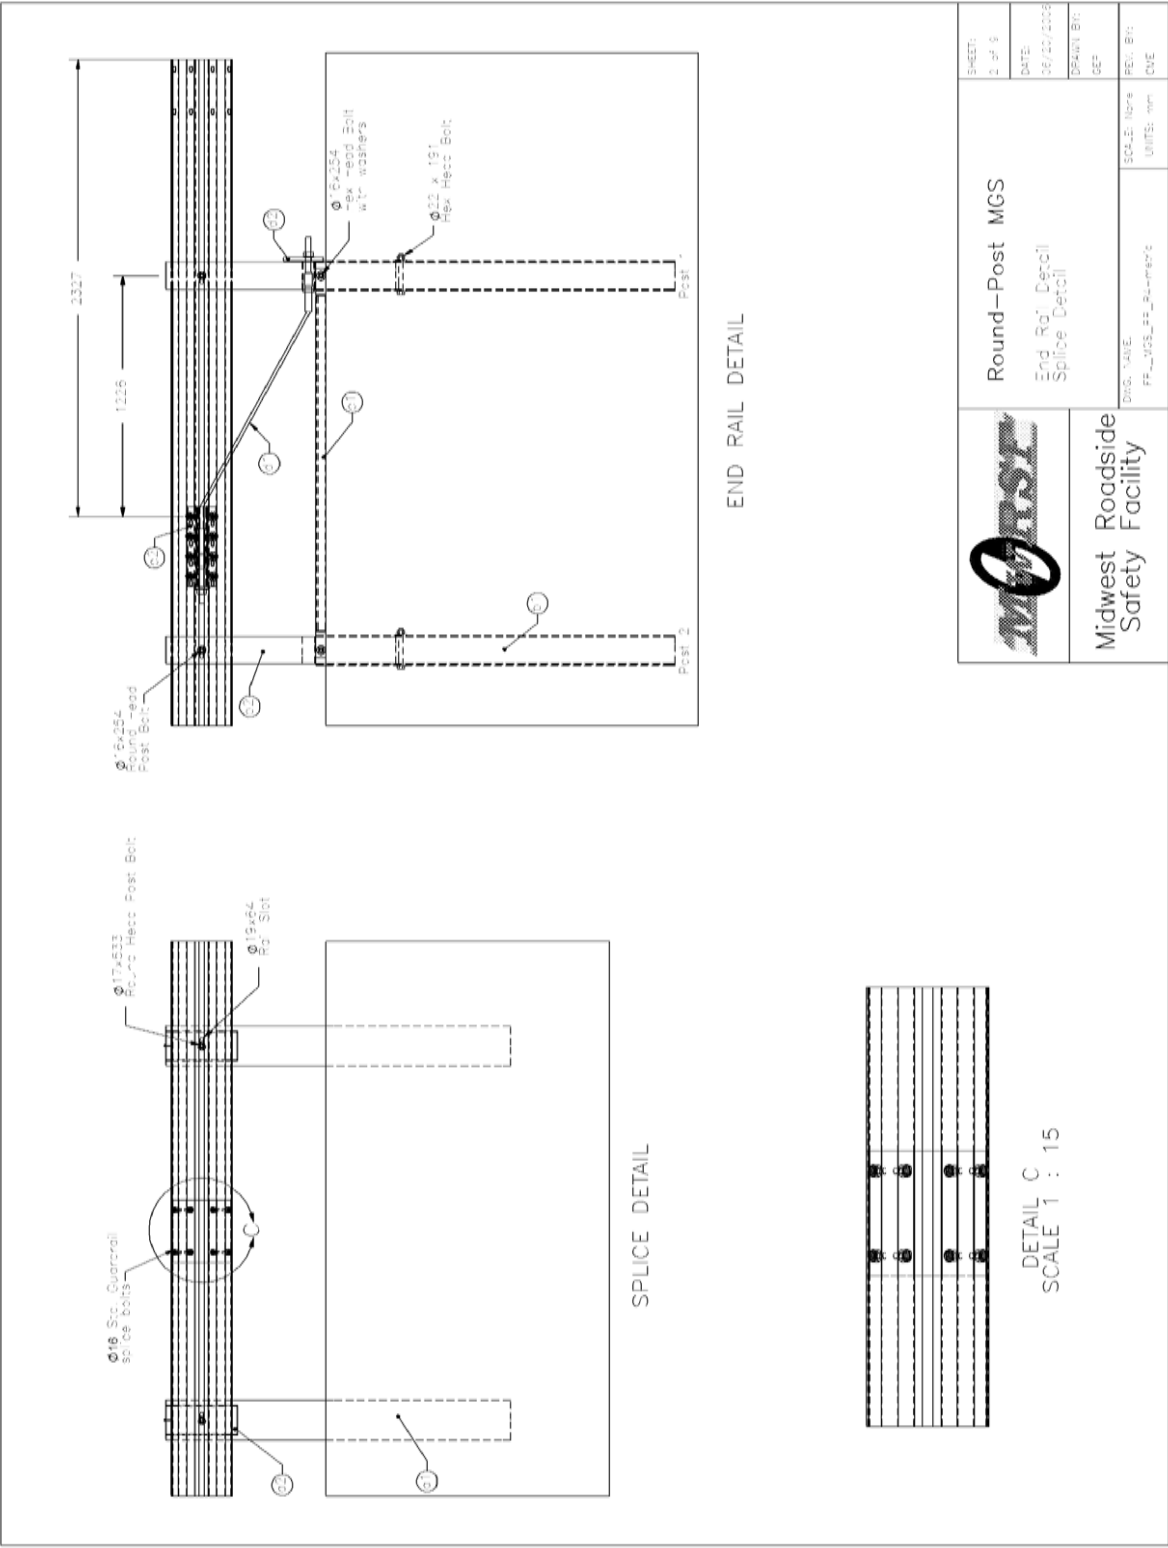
MGS Round Post Ponderosa Pine Details – End Rail and Splice Detail
